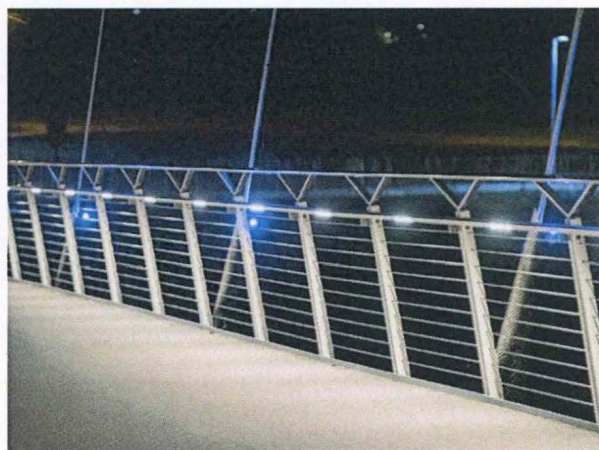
LED handrails installed along the River Thames bridge to illuminate the pedestrians and cyclists who are using the bridge.
